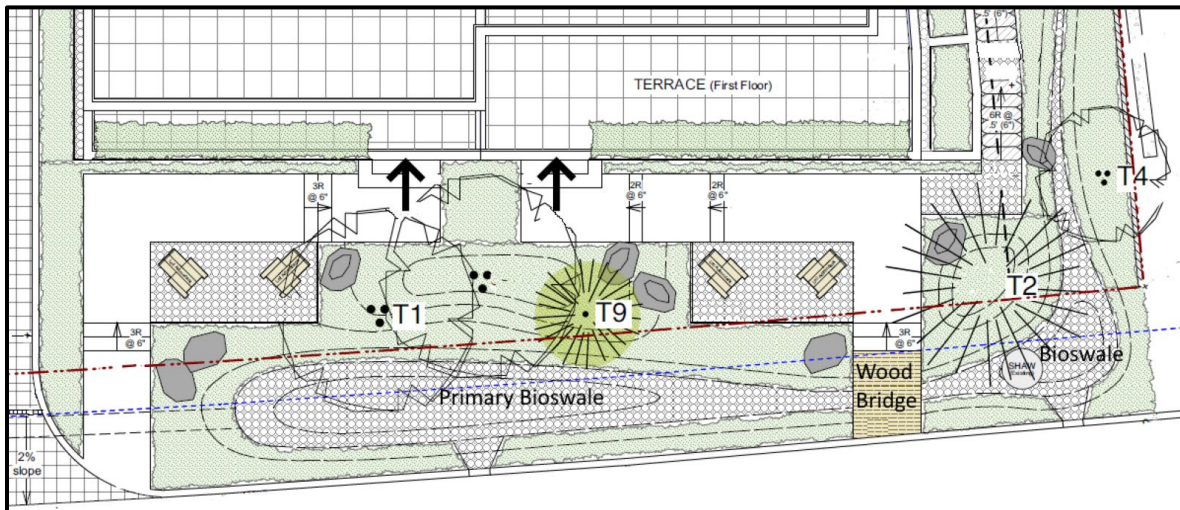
Excerpt of Landscape Plan (indicating front yard planting and drainage swales)
